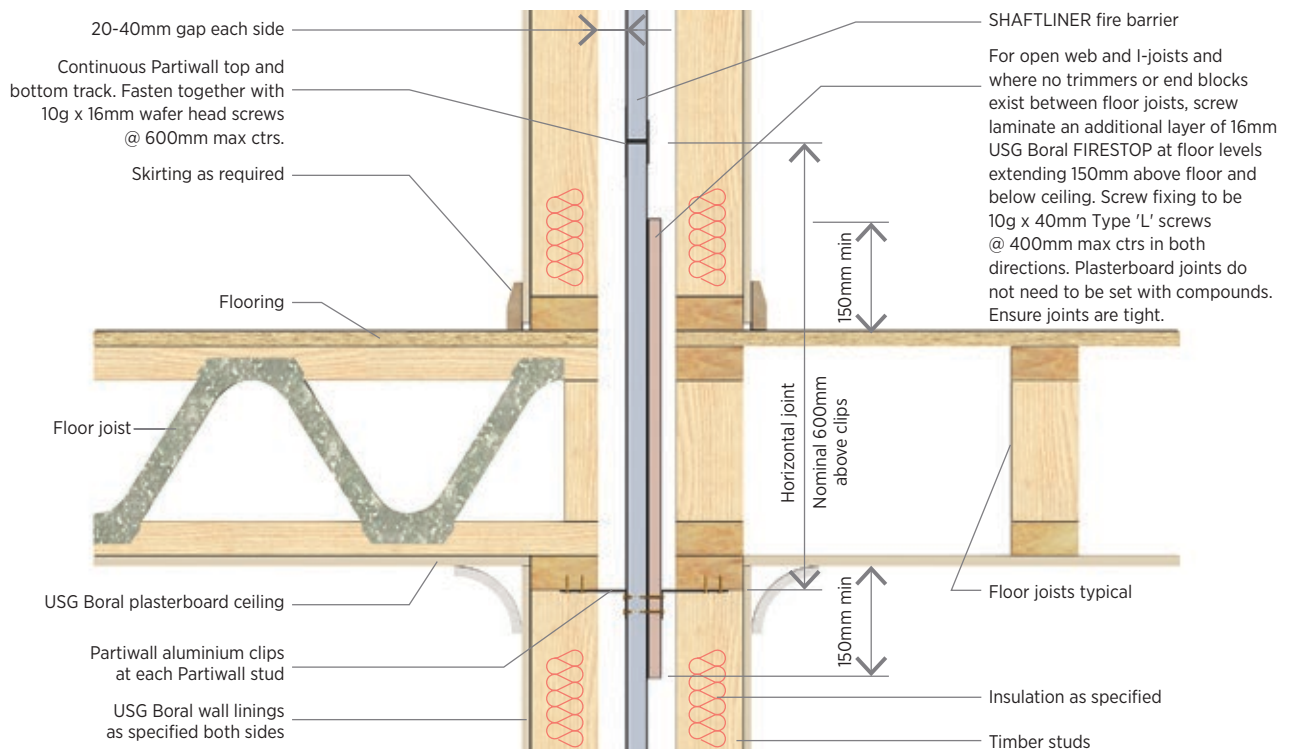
Floor/Wall Junction Detail 1 - FRL 60/60/60
